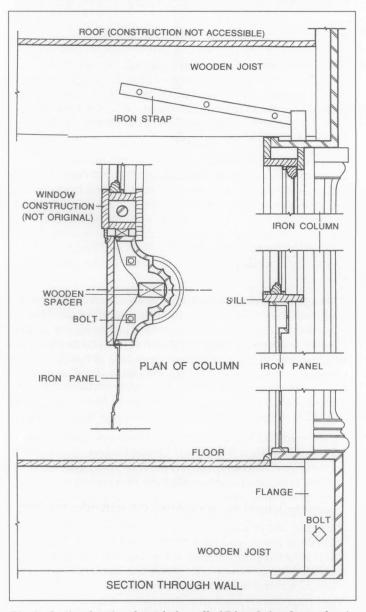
Section drawing through the wall of Edgar Laing Stores showing how the cast-iron facade components were anchored to the wood floor and roof framing members. Drawing: John G. Waite, HABS Collection.
